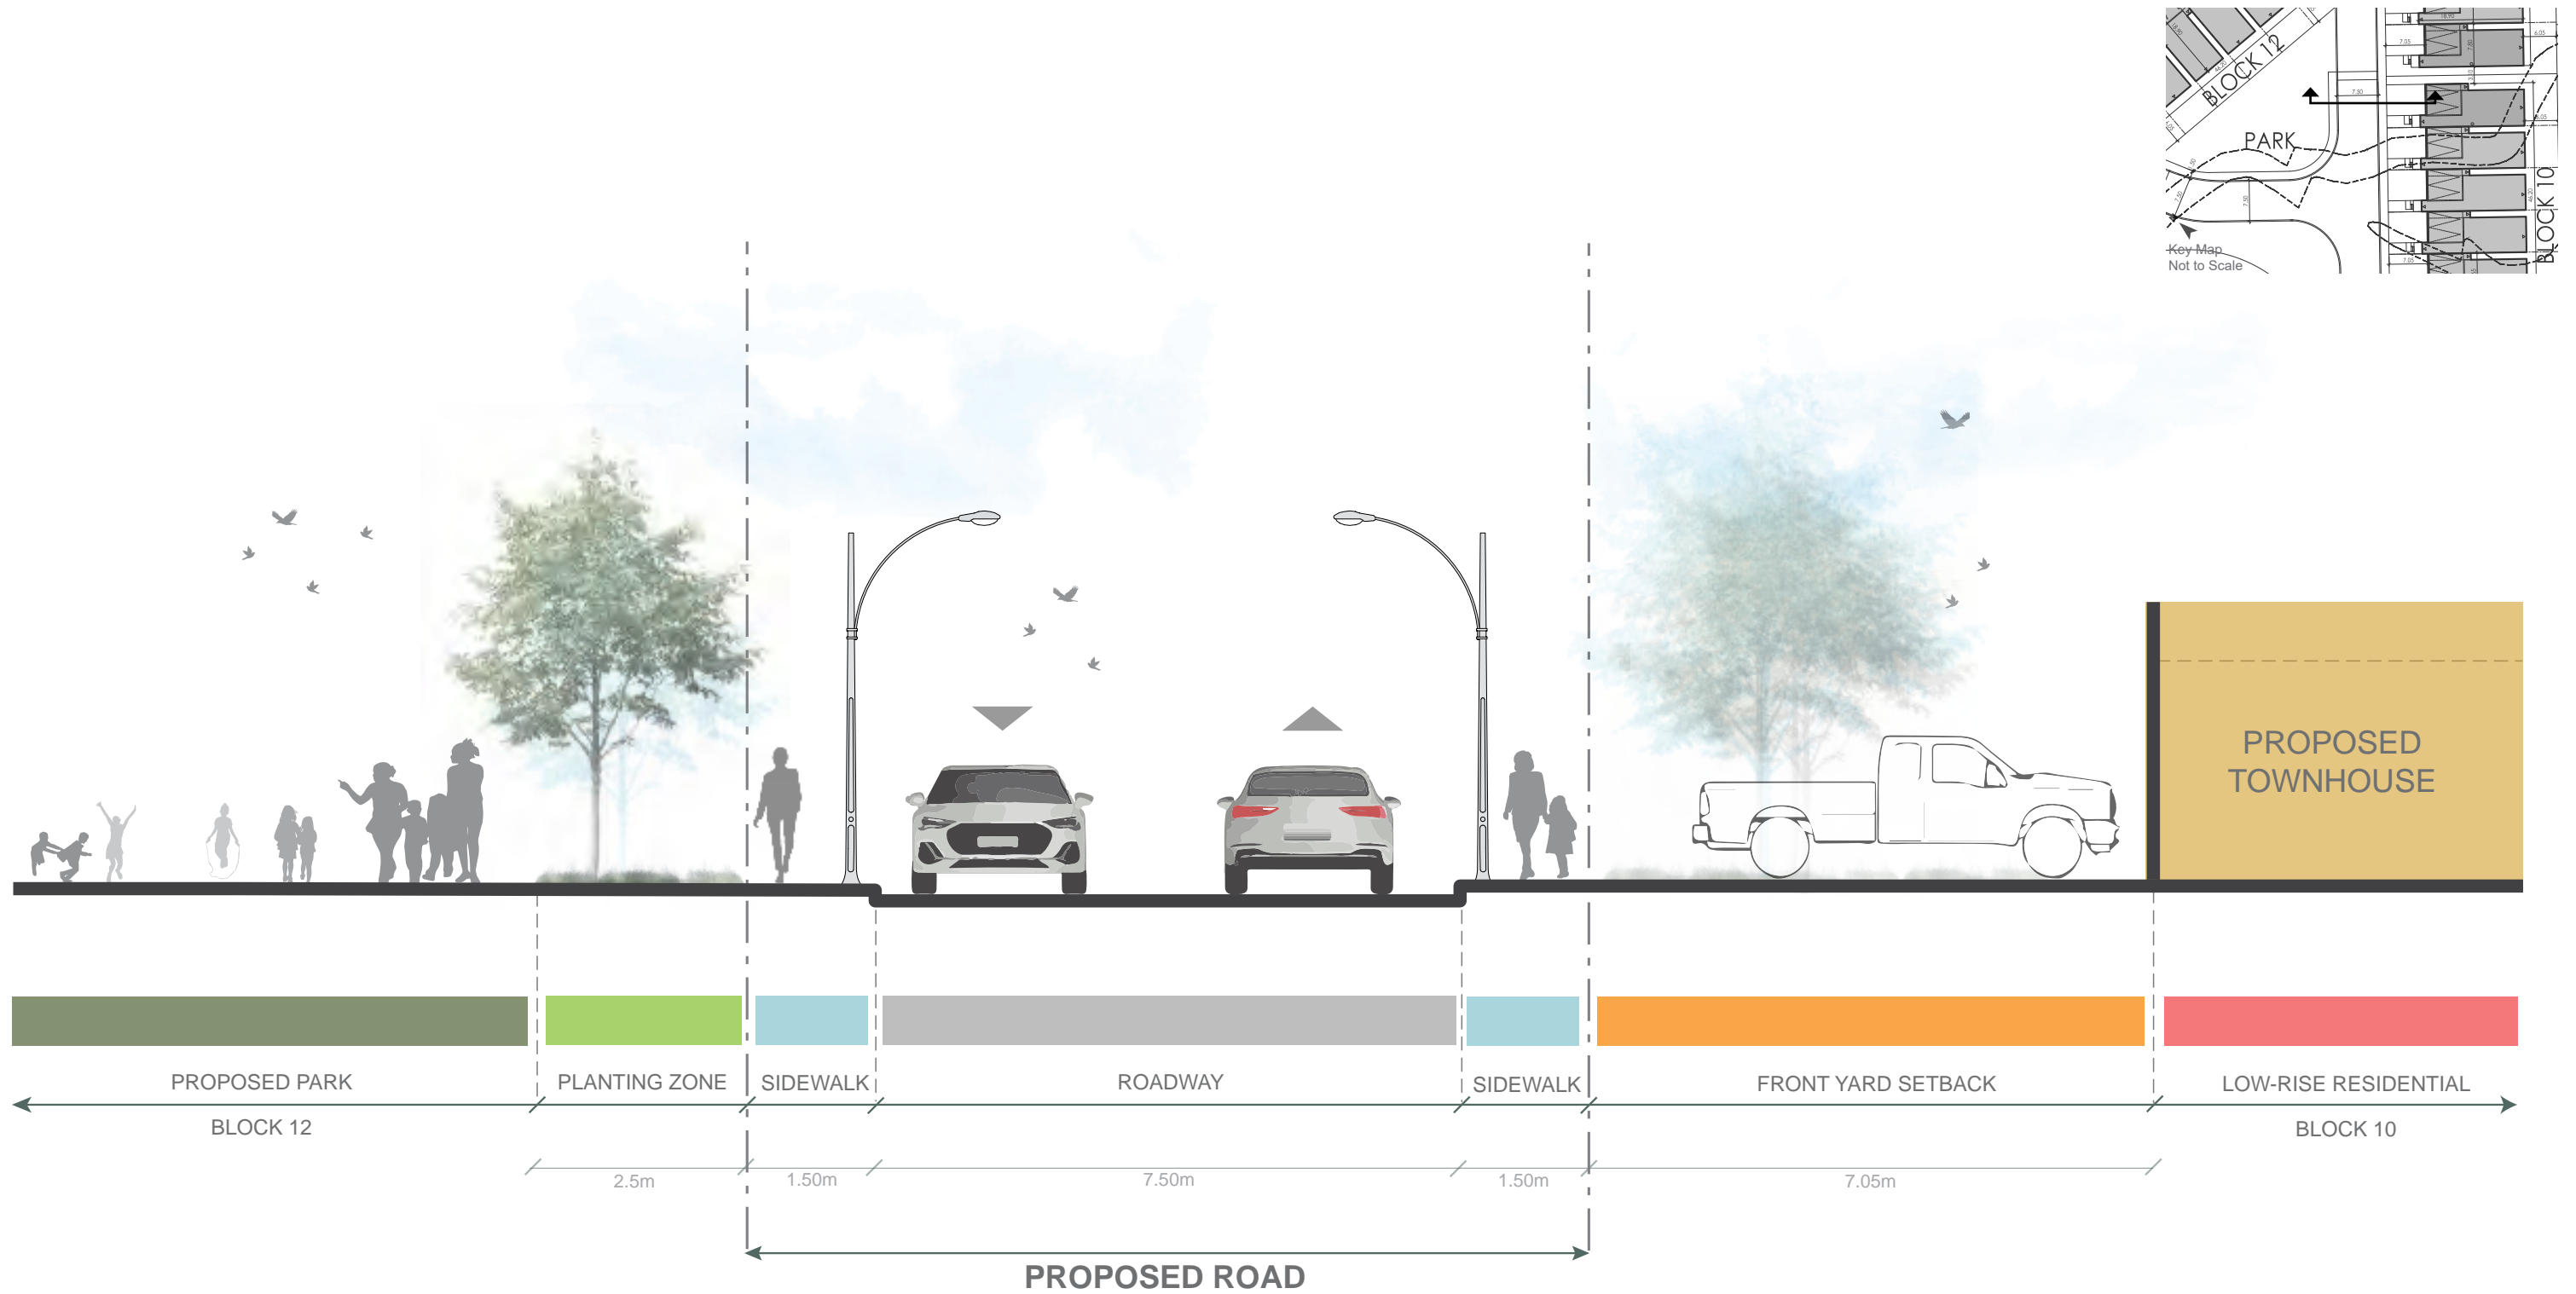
Conceptual Street Cross Section - Prepared by Weston Consulting
